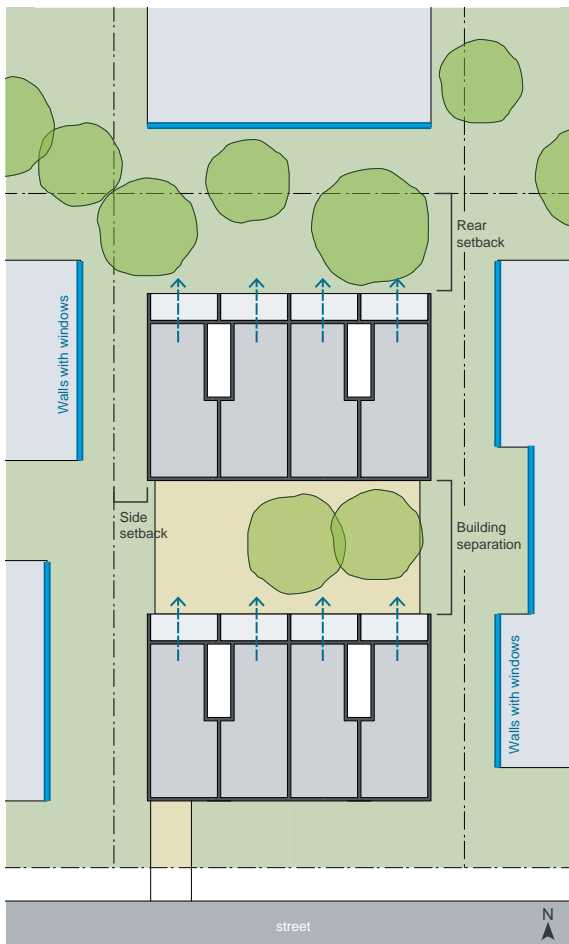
H.3 On narrow infill sites select a building type that orientates habitable rooms to the street and rear, minimising required side setbacks
